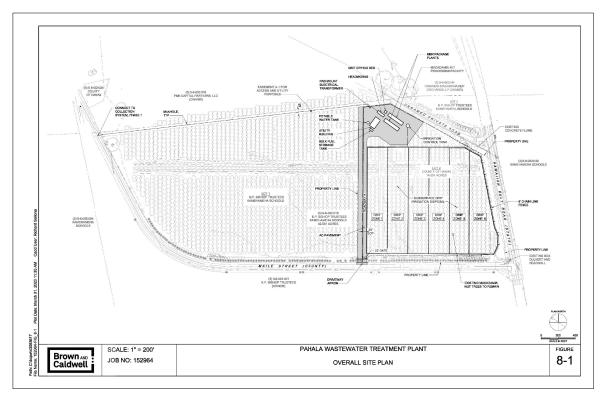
Overall site plan for proposed package plant (courtesy of client)
